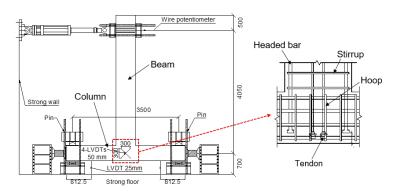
Lateral cyclic loading test of post-tensioned RC beam-column connections.
